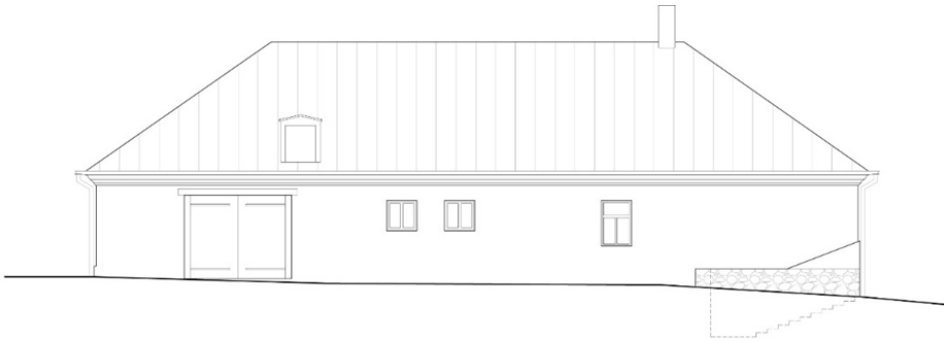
Architectural and structural survey of the manor building. Back, north-facing elevation.* By M. Krupa, D. Kuśnierz-Krupa, Ł. Bednarz, 2021.
